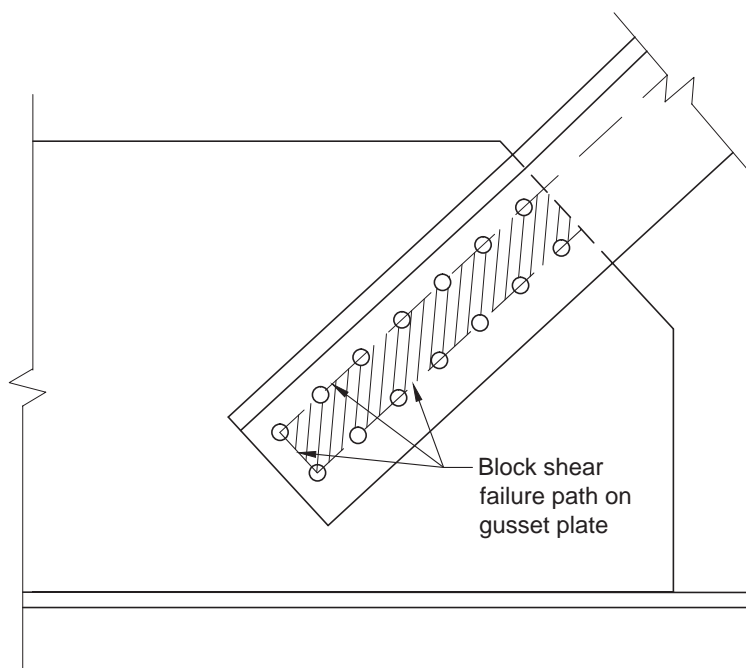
Block shear rupture failure path on gusset plate.
